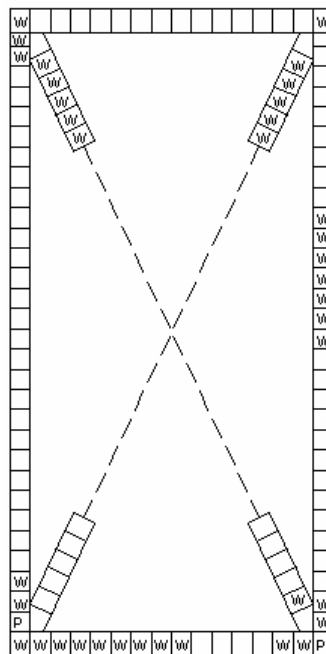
Sheathing nail failure modes for Wall A8.
